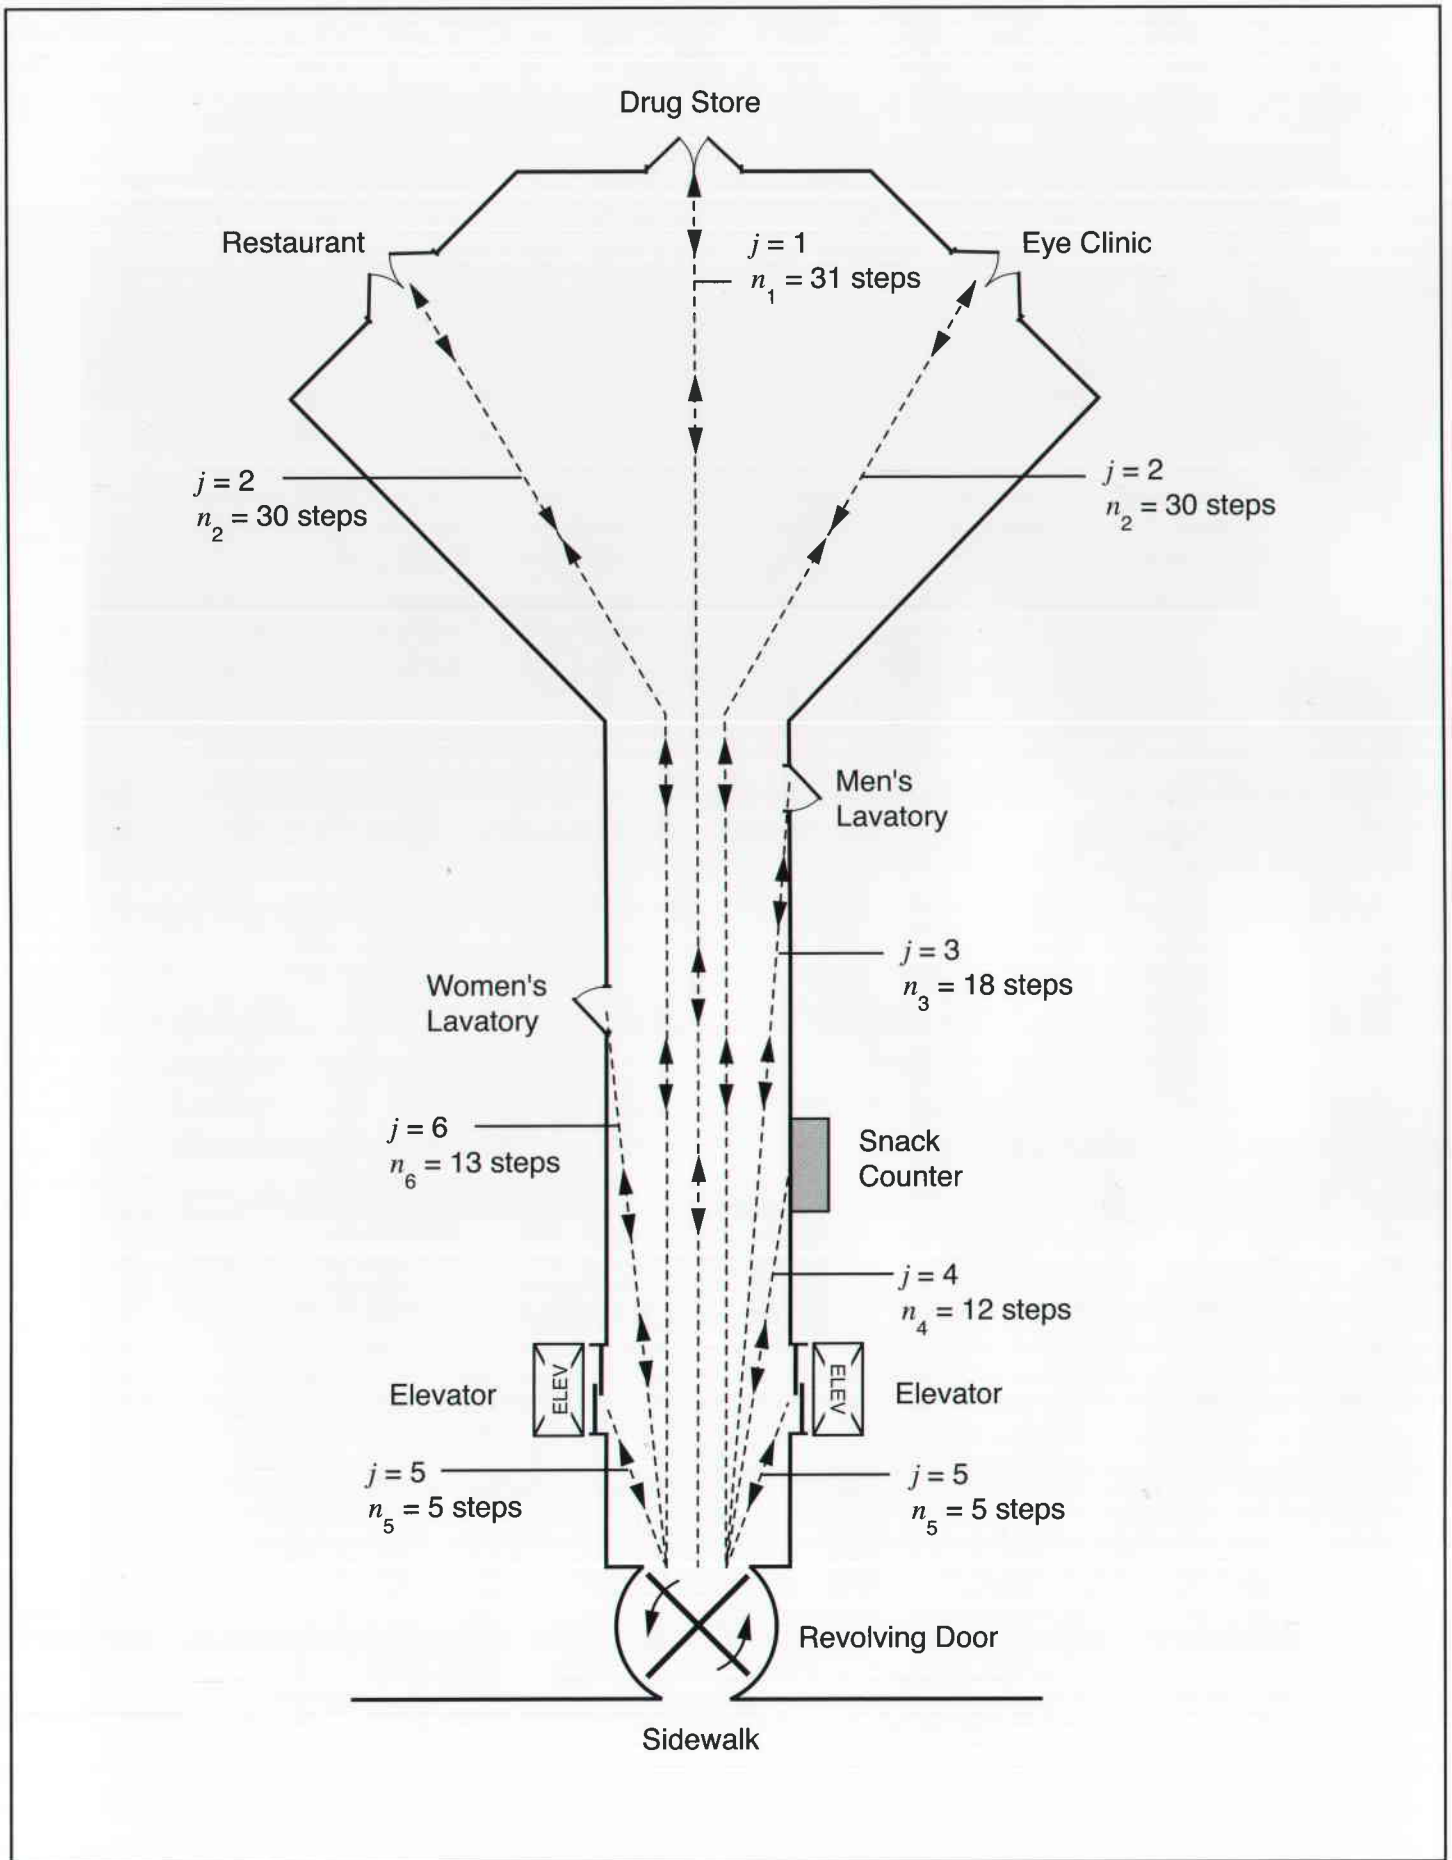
Commercial Floor Plan - Traffic Patterns, j
